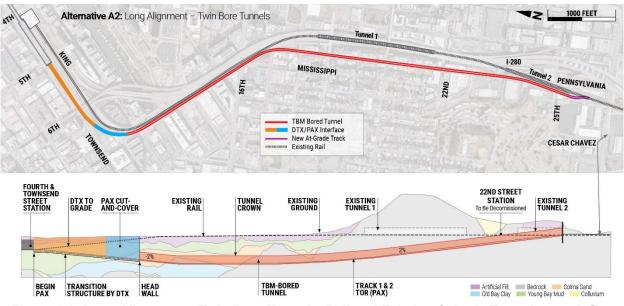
Long Alignment – Twin Bore Tunnels. Rail and Existing Caltrain Tunnels noted. See also Appendix B.
